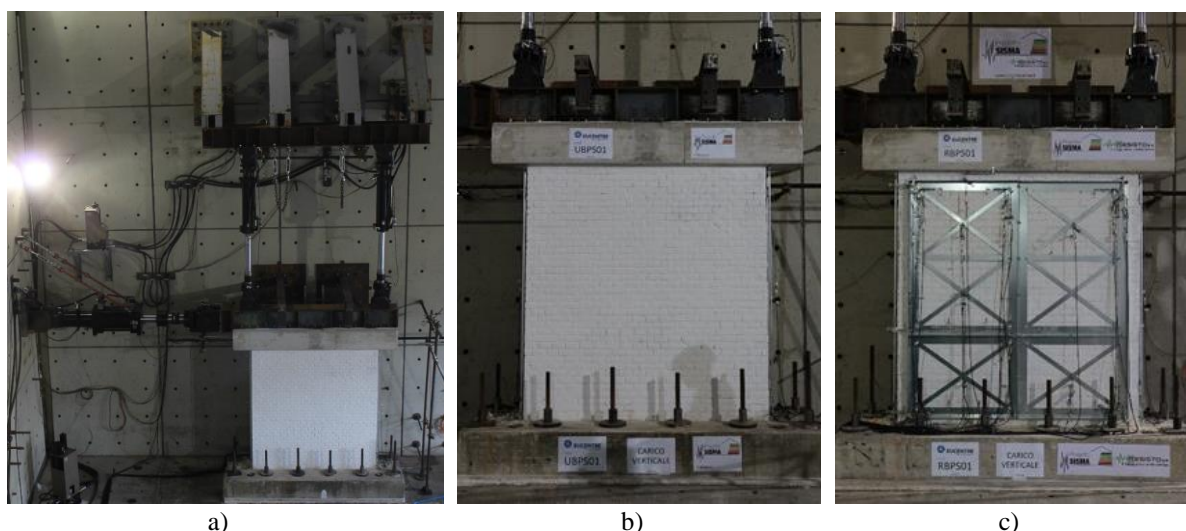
Experimental in-plane tests: a) set-up; b) unreinforced specimen UBPS01; c) retrofitted specimen RBPS01.
